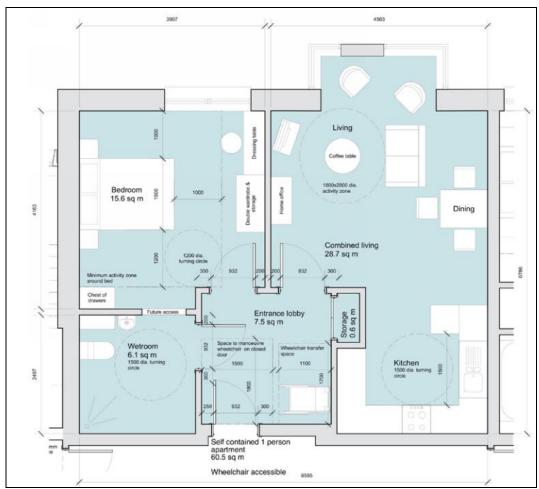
Indicative layout of self-contained wheelchair accessible units (one will be located at first floor level and one will be located at second floor level).
